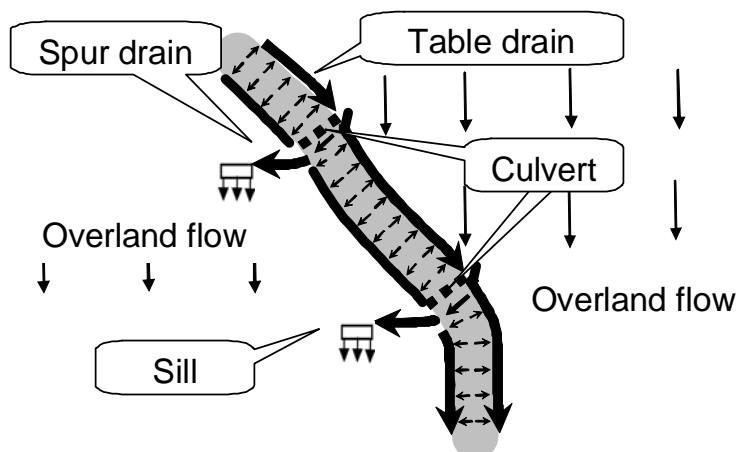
Spur drains collect runoff from table drains and culverts on a formed road.
